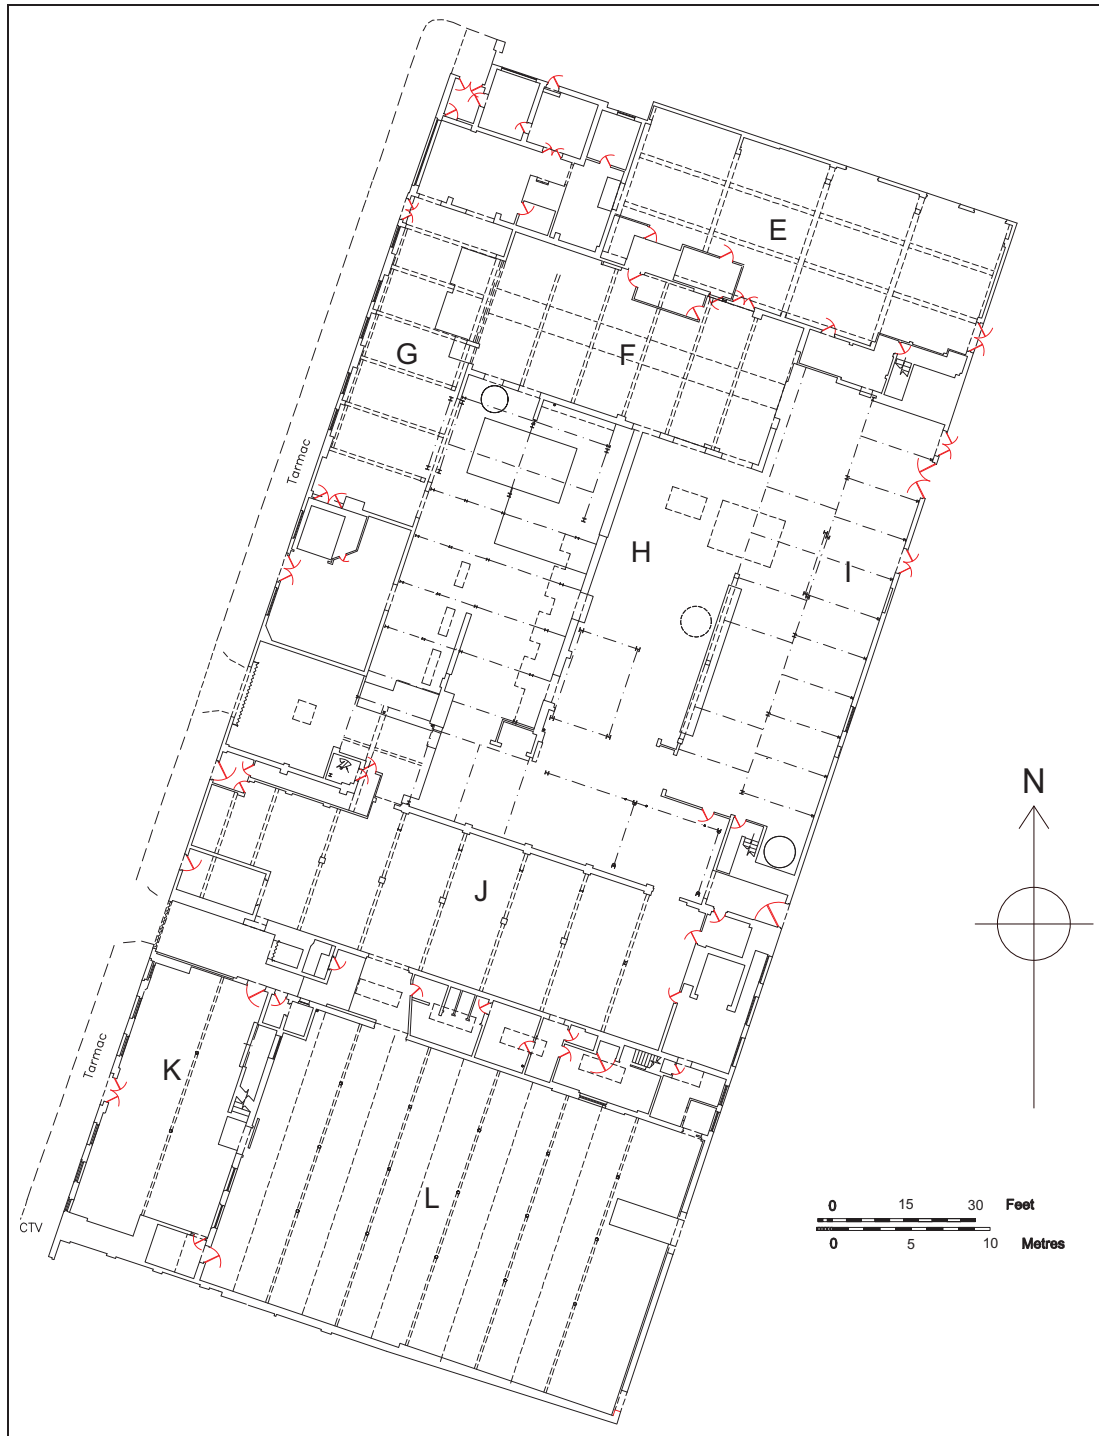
Ground Floor Plan of Blocks E-L, 12-20 Canal Street, South Wigston.
